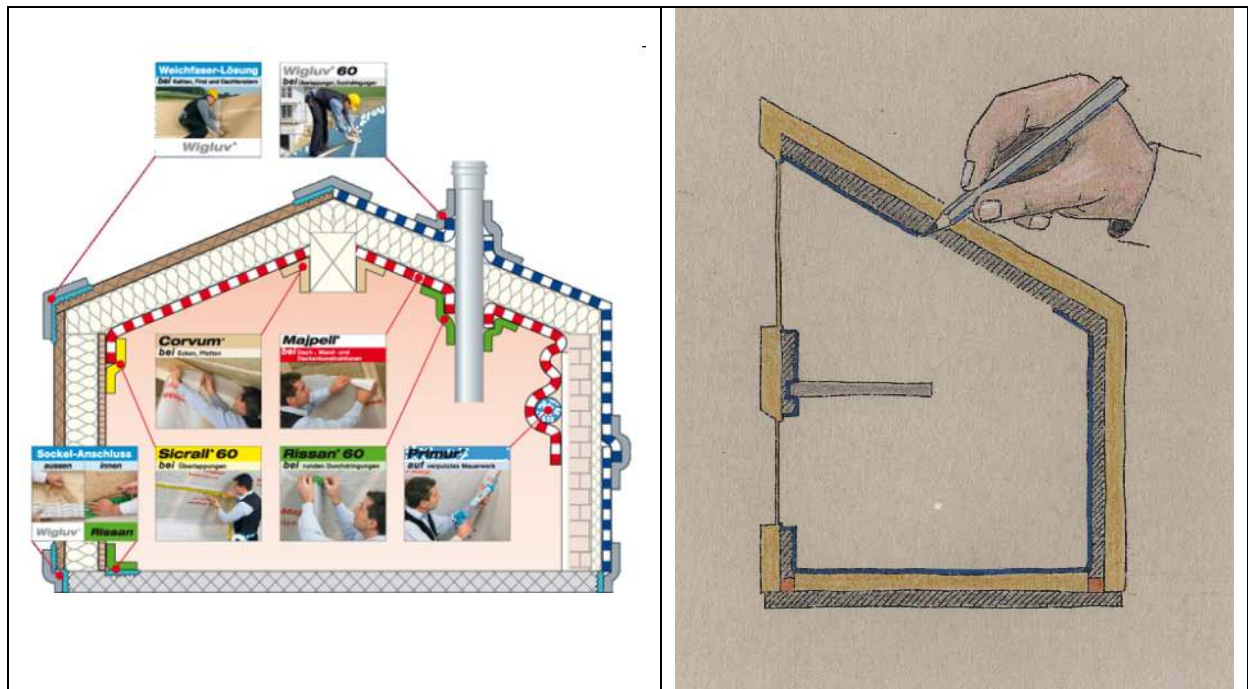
Airtight building envelope; pay attention on building breaches (References: Siga; PHI Darmstadt)
